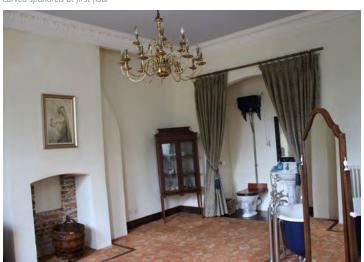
View of part of the bridal preparation suite at first floor showing modern cornicing poorly applied across the chimney breast
